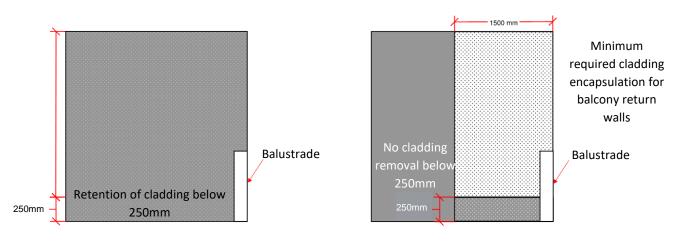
Elevation of balcony return wall cladding encapsulation (left) and cladding removal (right)
